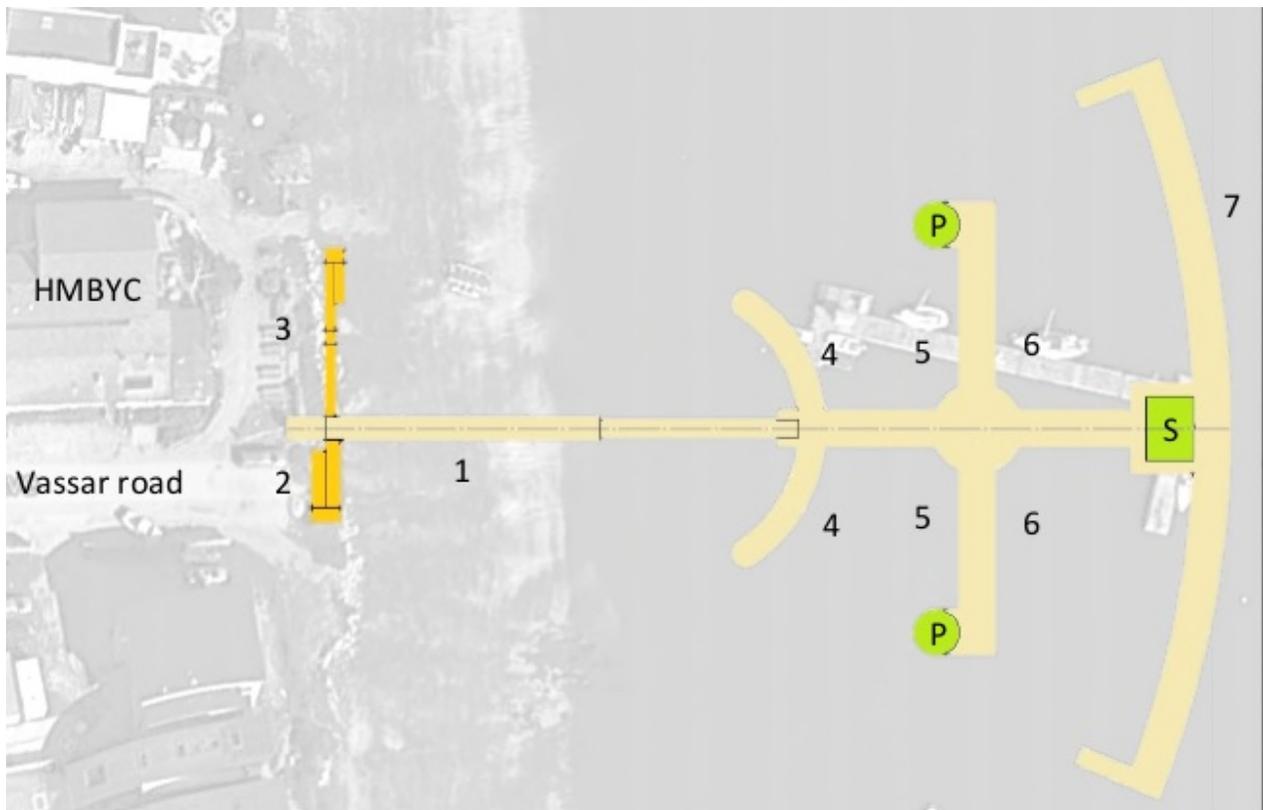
Overlay of pier and floating dock adjacent to Vassar Avenue
